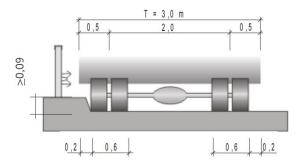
Position of a vehicle sideways next to a curb (NPRA 2021c).
